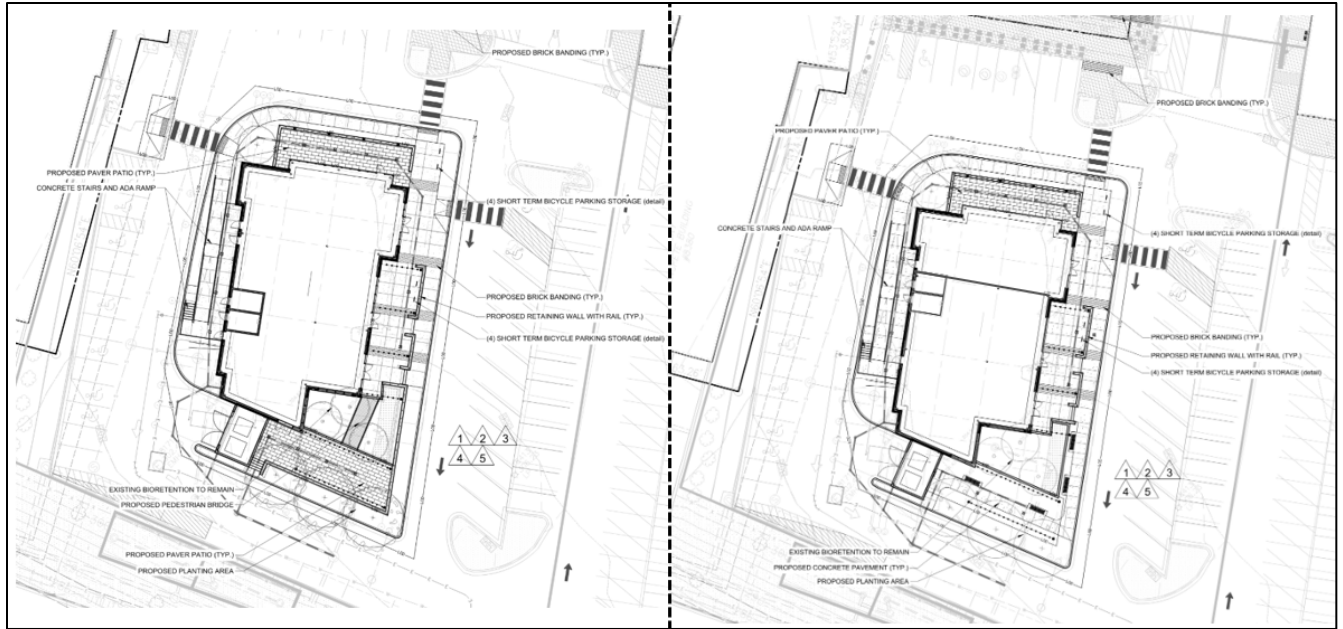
Building Plan (Retail Left, Animal Hospital Right)
